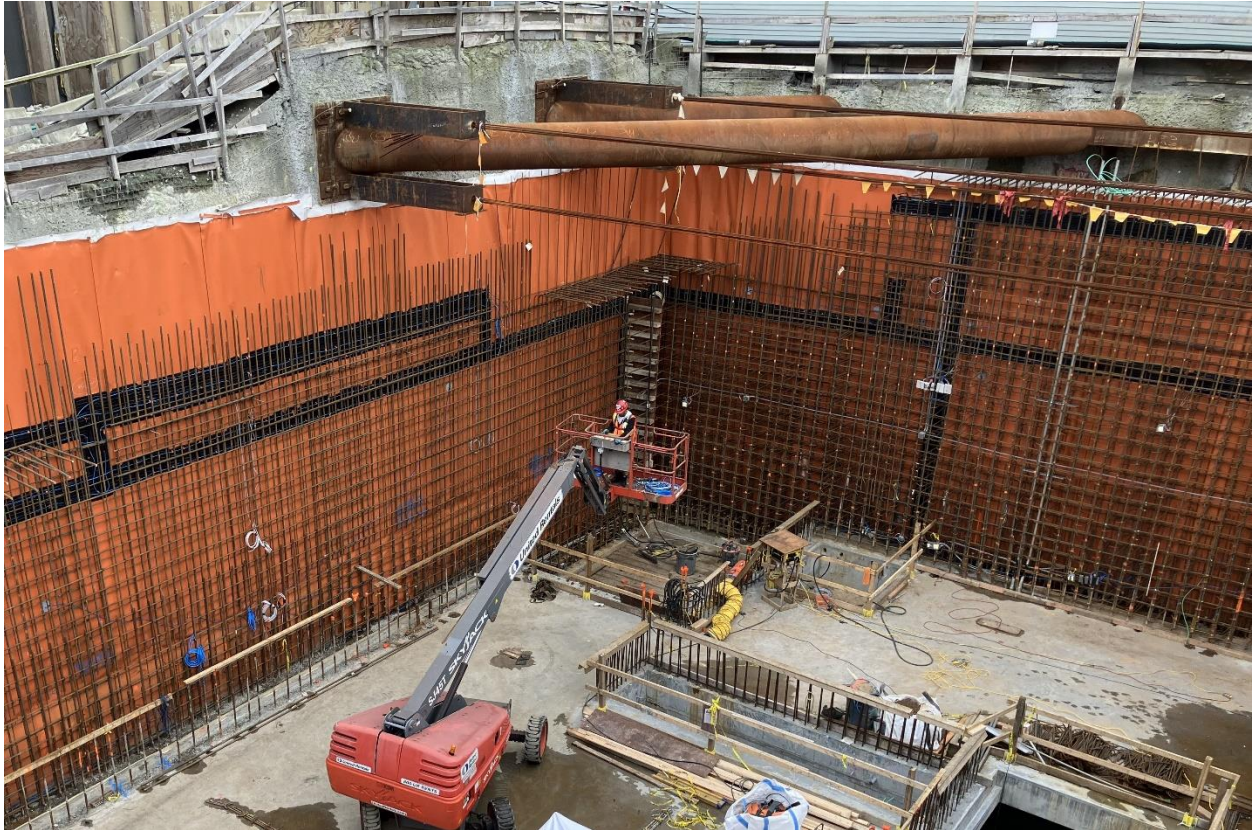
Mount Pleasant Station: Progressing with installation of rebar for the concourse level walls in the headhouse.
